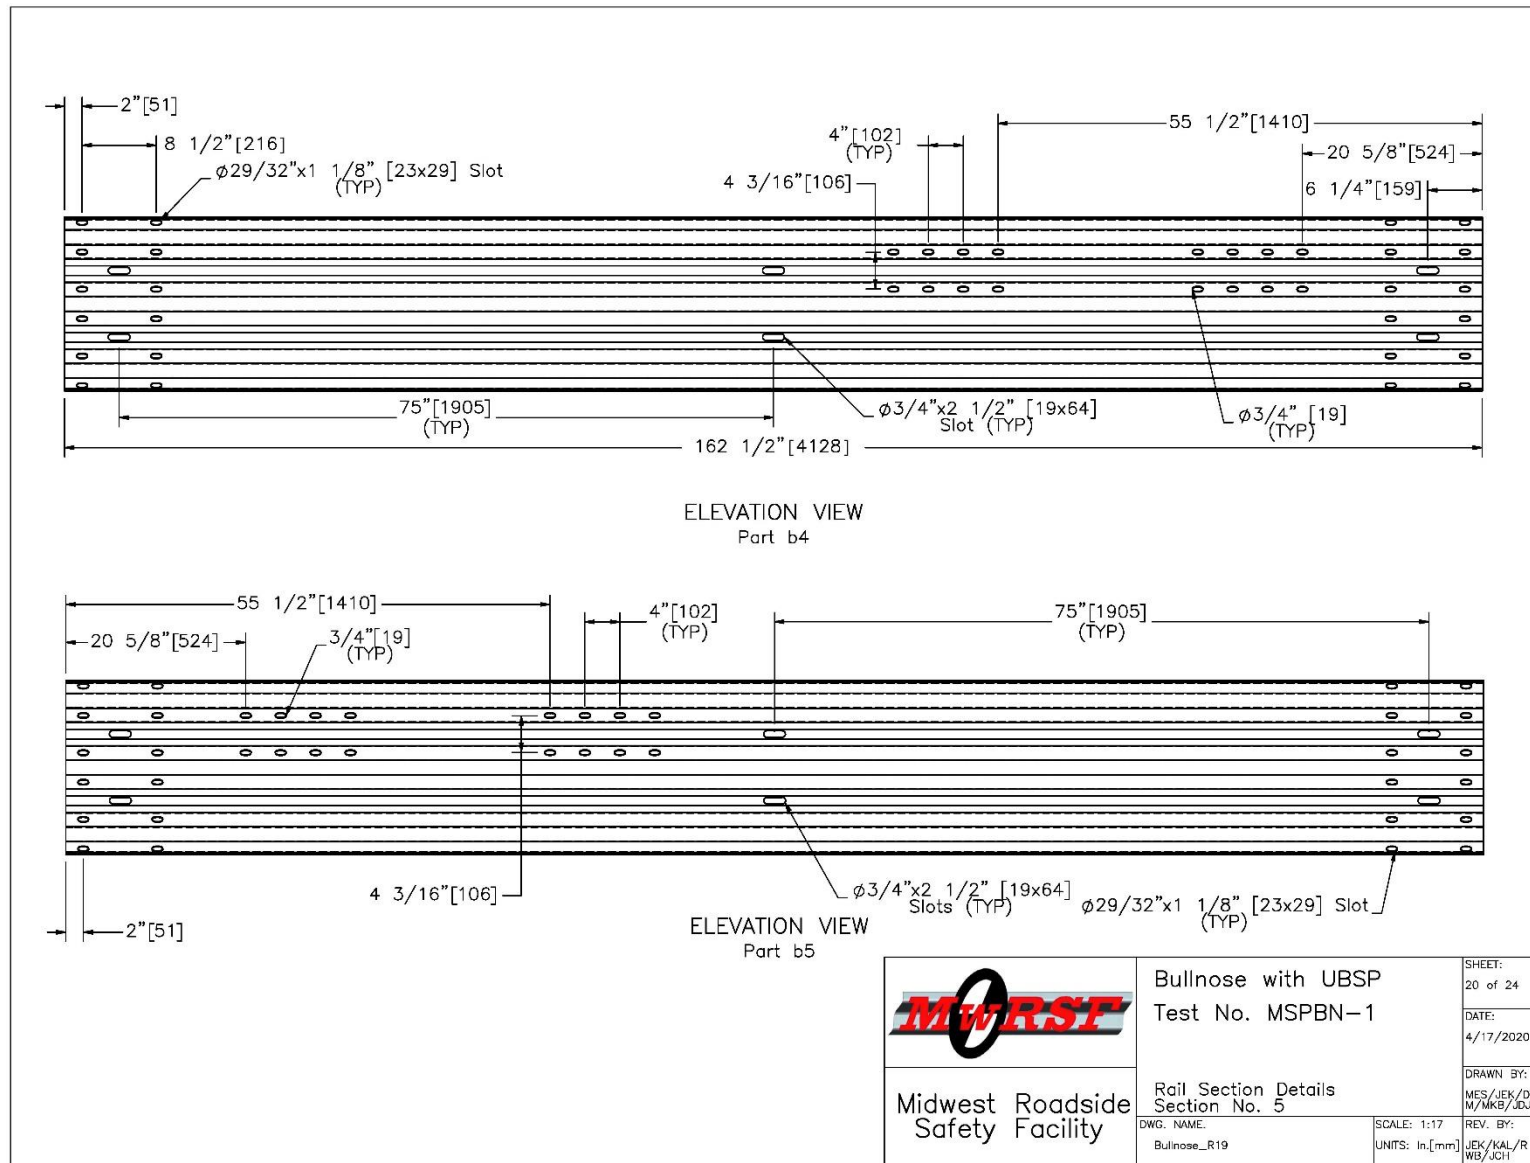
Rail Section Details Section No. 5, Test Nos. MSPBN-1 through MSPBN-3
